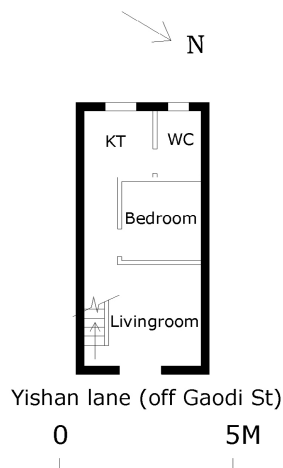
Floor plan of a single-storey zhutongwu house. Based on author's field survey.
